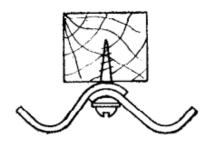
FIXING CORRUGATED ASBESTOS — CEMENT SHEETS
